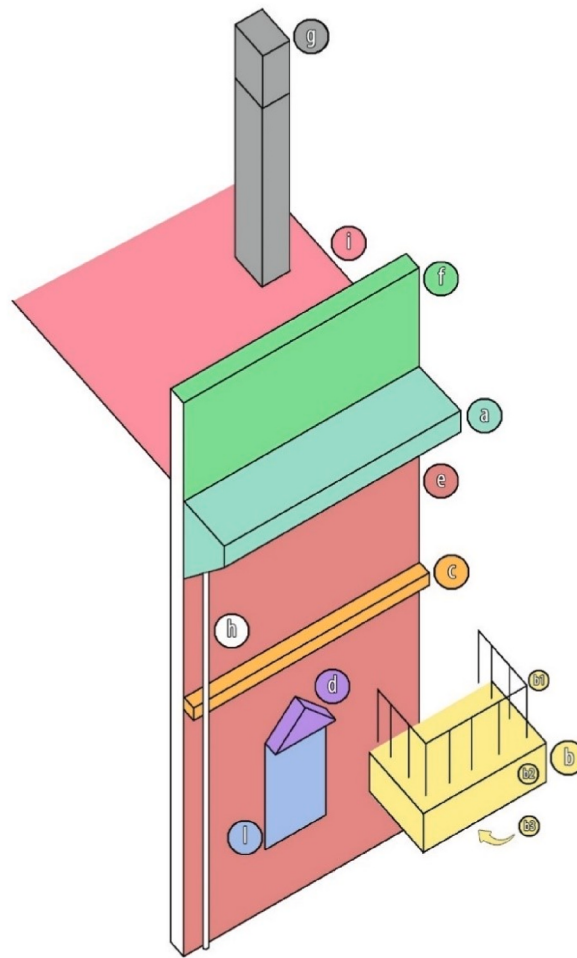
The technical elements of the building envelope (a: cornice; b: balcony; c: string course; d: decoration; e: exterior wall; f: parapet; g: chimney; h: household drain system; i: roof covering; l: window).
